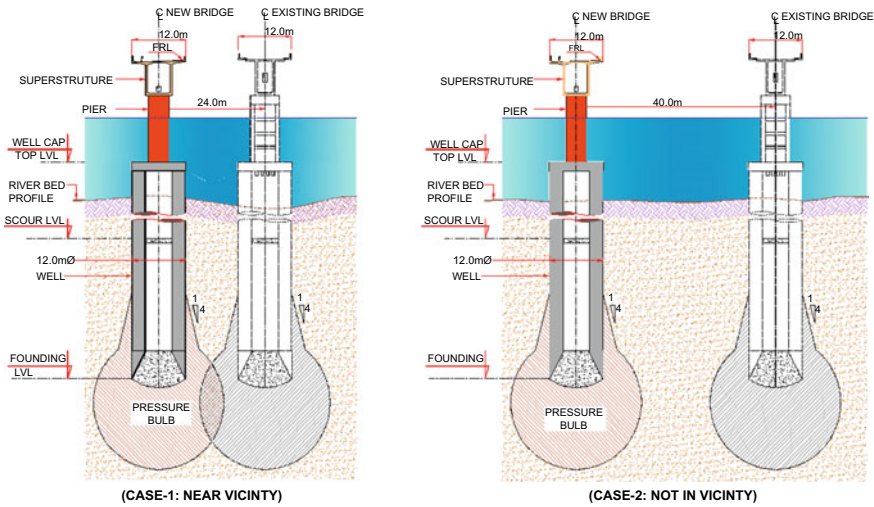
Foundations of bridges in near-vicinity of an existing bridge
